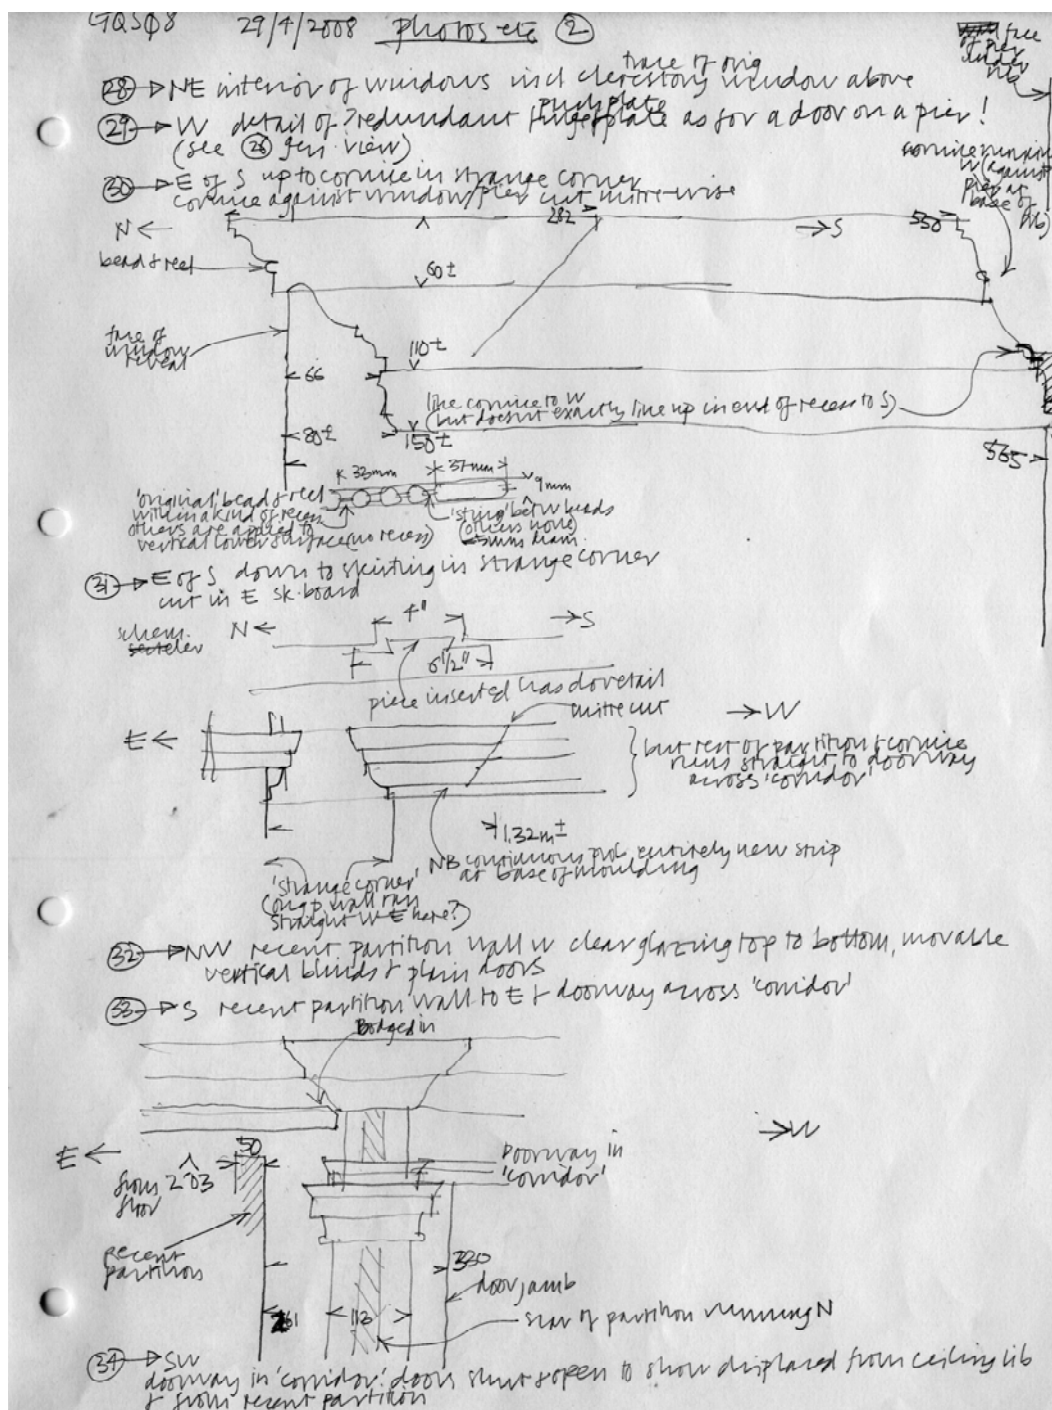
Above: dimensioned sketch of cornice in south-east corner of room 27 (Context 10). Below: dimensioned sketch of a door jamb and pier in the south-west corner of the central passage 26 (Context 9).
